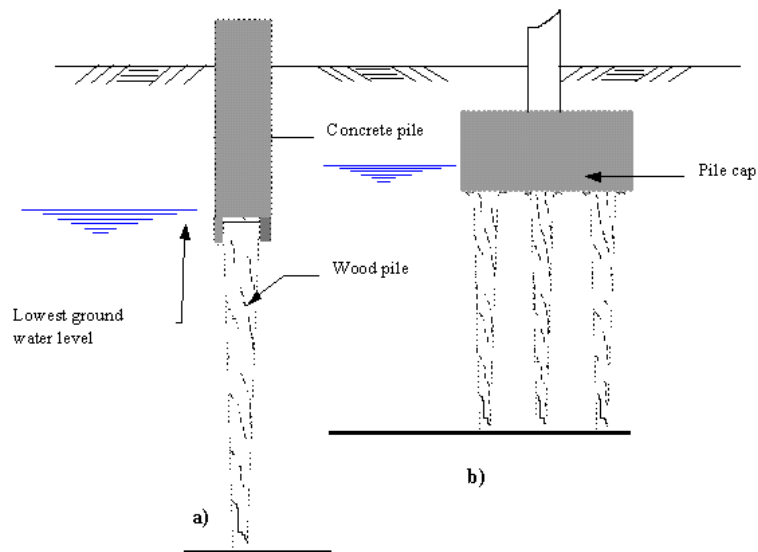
Combination pile made of concrete and timber piles for protecting timber piles from decay (School of Engineering and Built Environment, Napier University, 1999)
